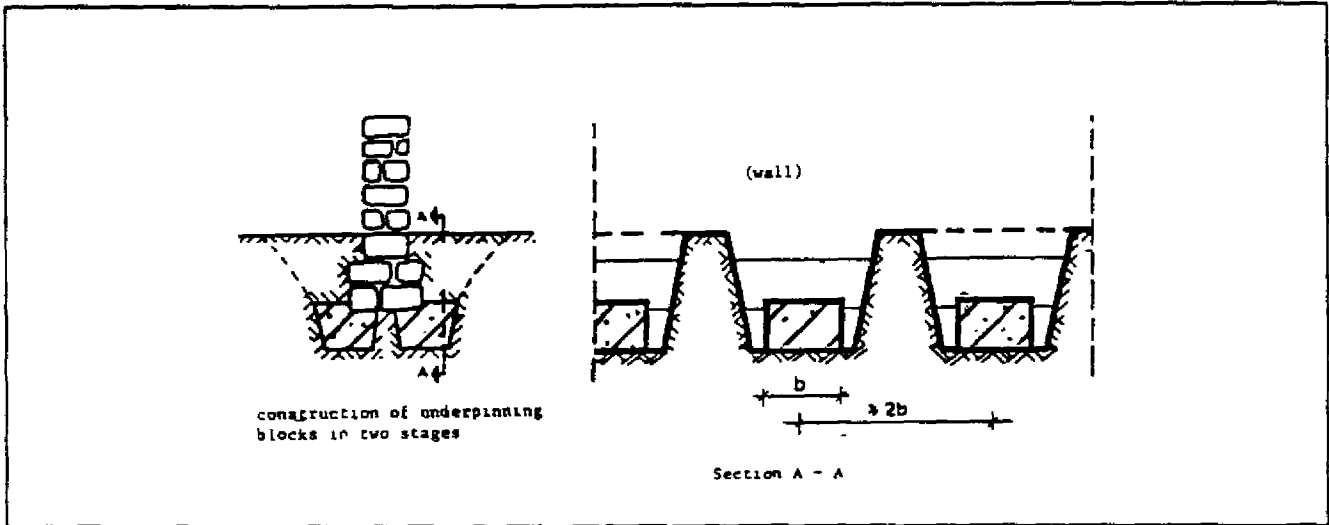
Construction of Underpinning Blocks Two Stages
